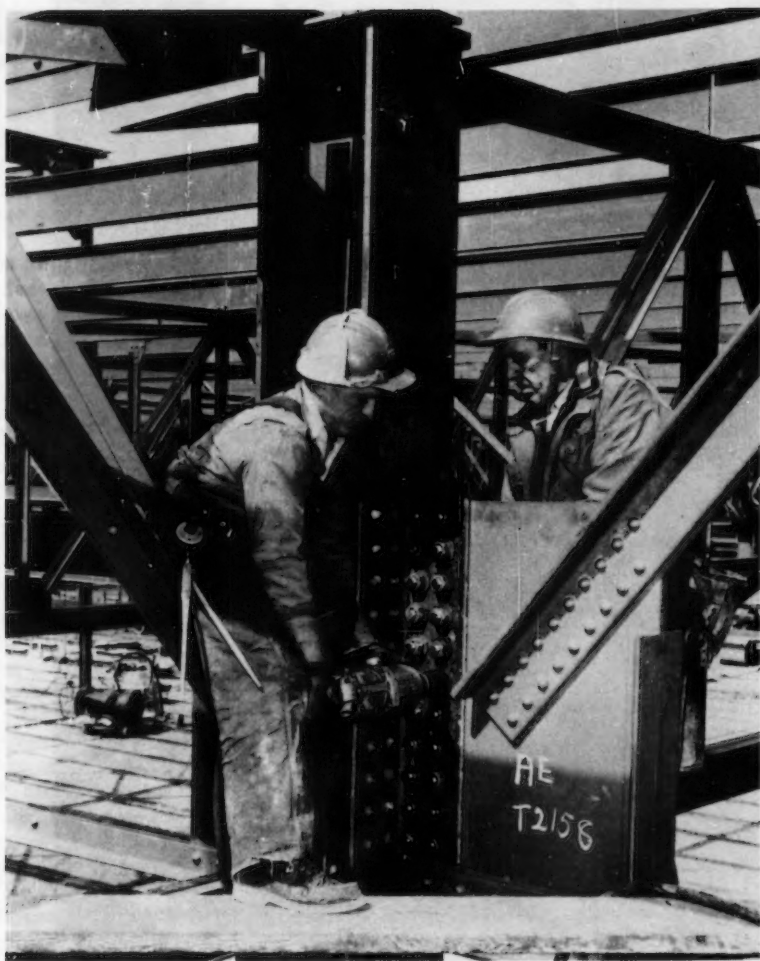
Impact wrenches are slightly heavier than riveting hammers; the physical effort required of the wrench operator however, is considerably less than required of riveters.
